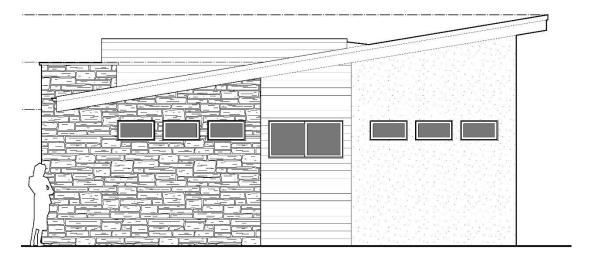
Proposed elevation of carriage house as viewed from the rear lane.
